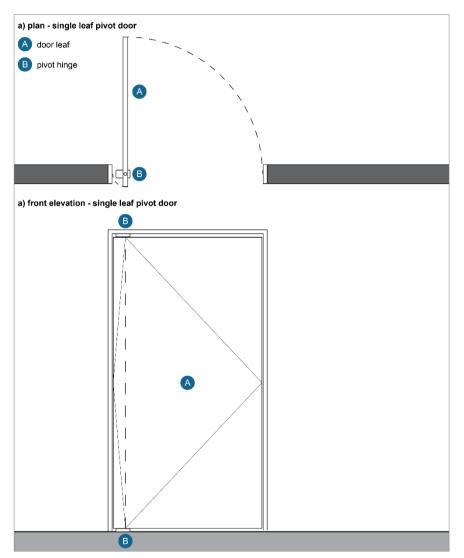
Diagrams of single leaf pivot doors in a) plan, and b) elevation
